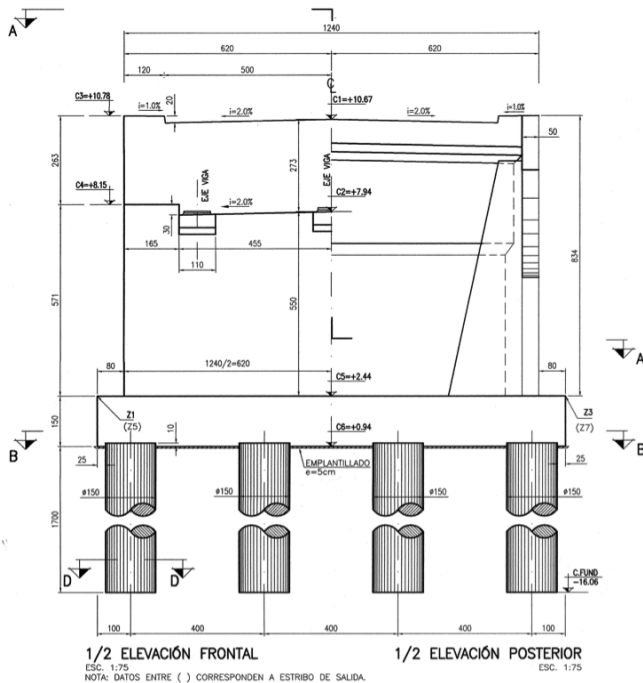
Elevation view of abutment at Mataquito Bridge (dimensions in cm).
